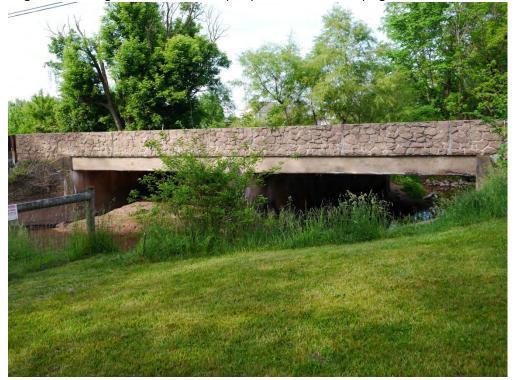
Bowmansville Bridge on SR 625 in Brecknock Township, Lancaster County. The bridge form liner was designed to mimic the stone in the roller mill adjacent to the bridge.
